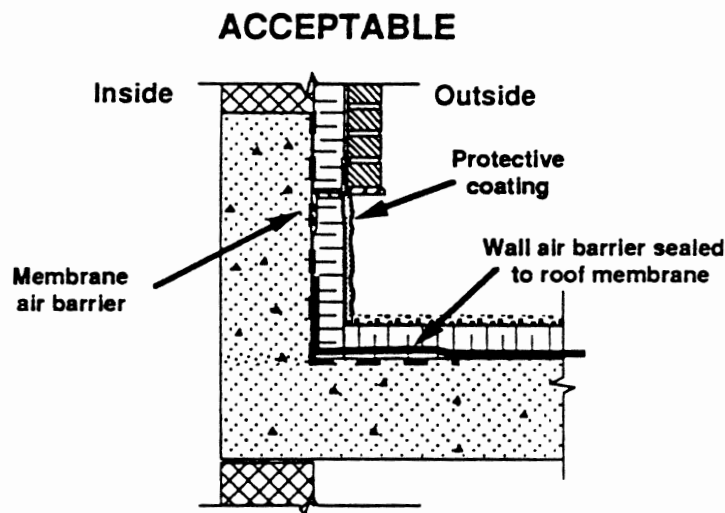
Masonry Setback Wall/Roof Connection - Concrete Frame (Brand)
